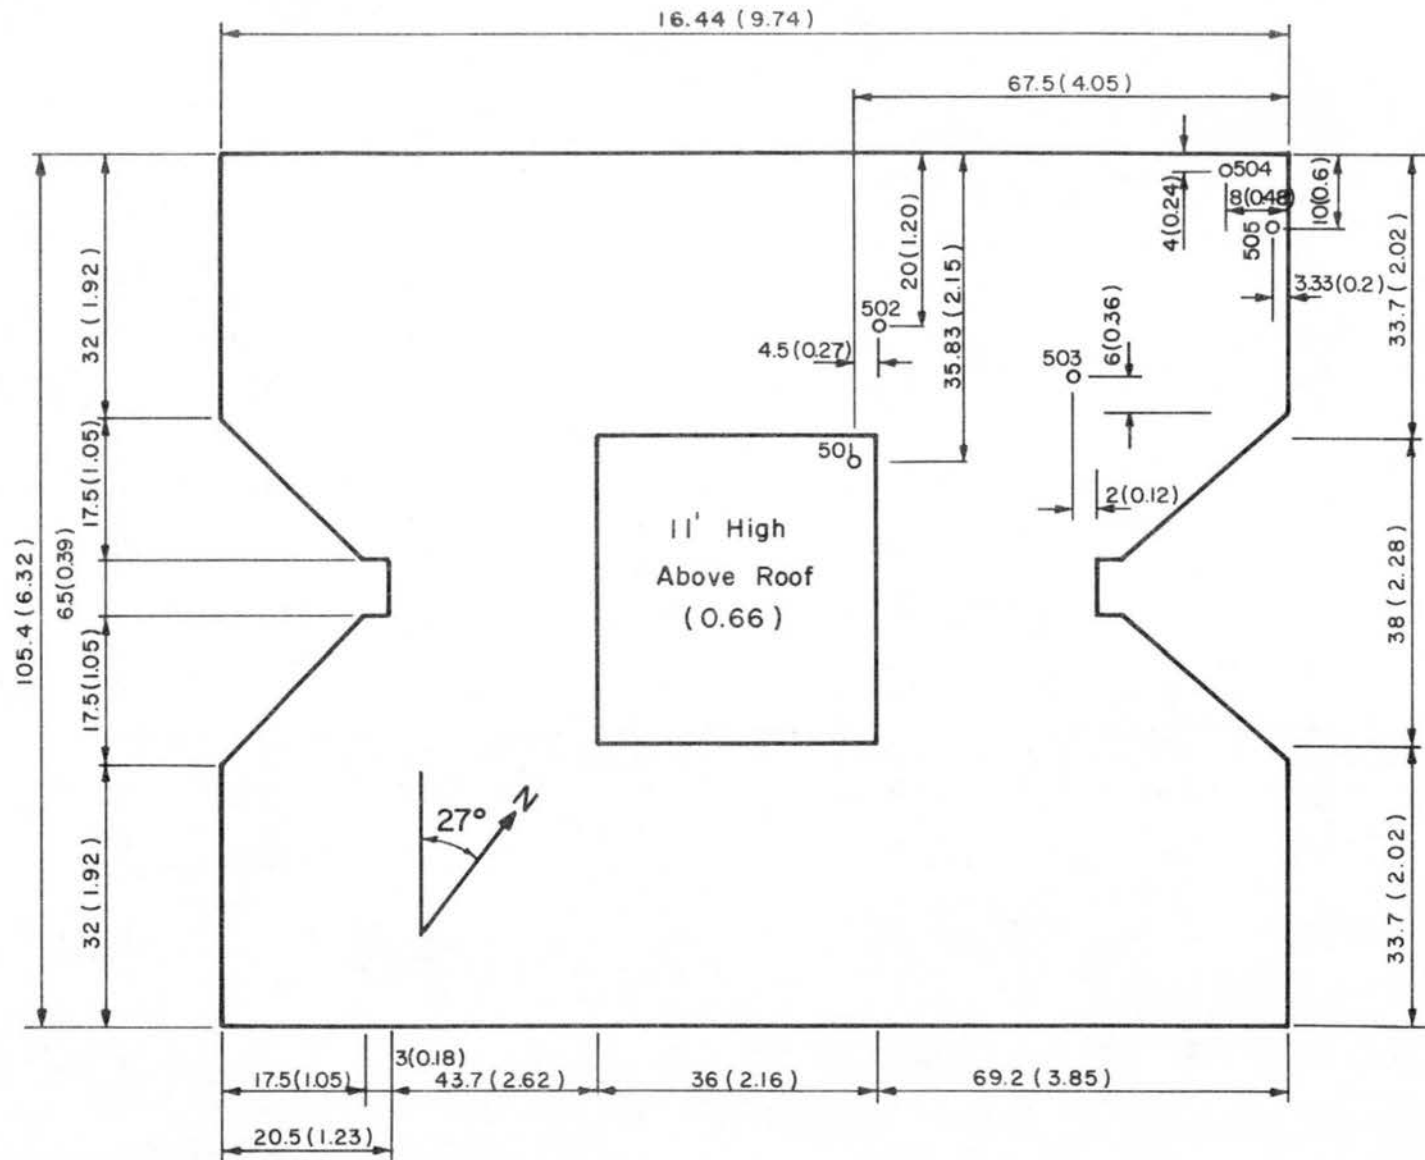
United American Plaza, Knoxville, pressure tap locations. Note: Dimensions on horizontal lines are prototype feet and model inches, model scale 1:200.
